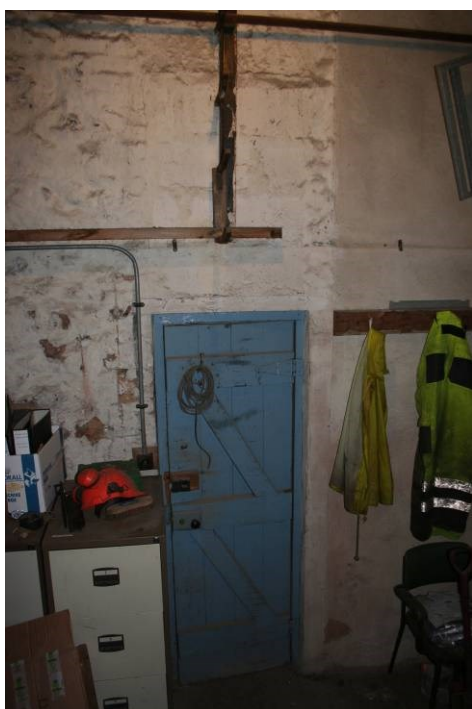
Building 17a blocked window in east wall of 7a with inserted door opening
